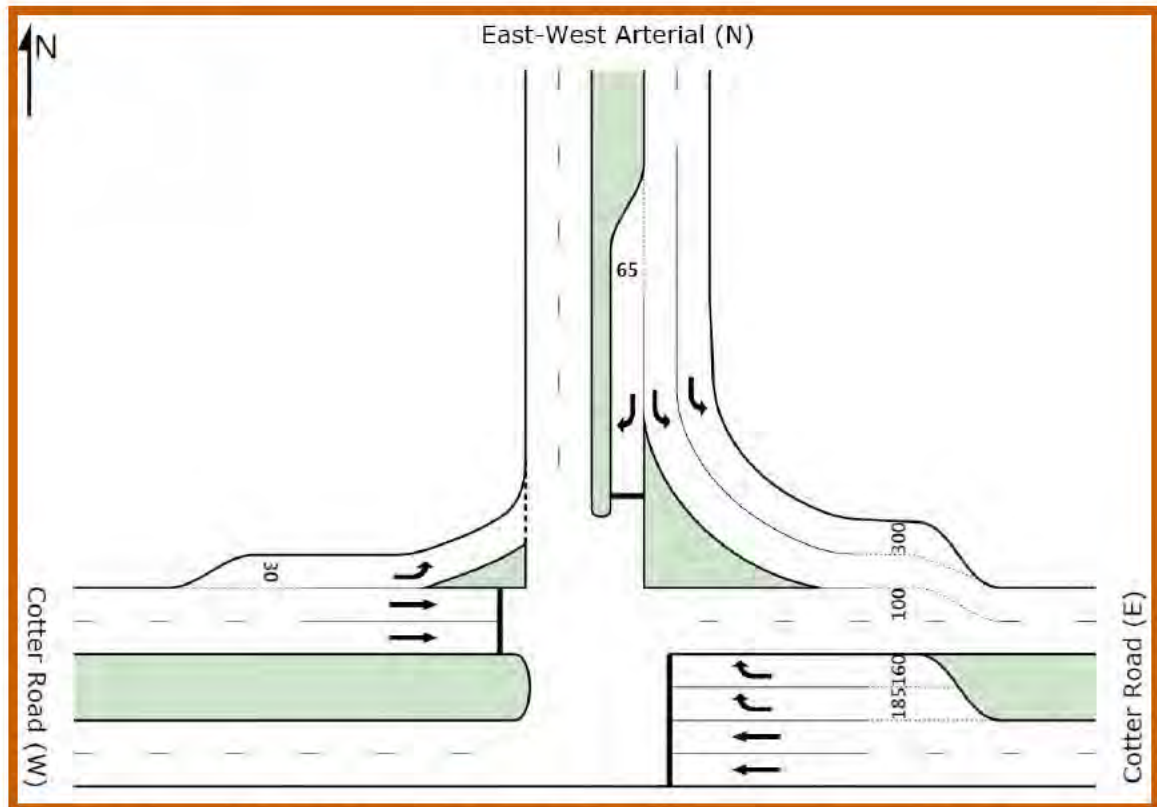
Intersection Layout of Cotter Road – East-West Arterial (Tuggeranong Parkway North Facing Ramps 2031)
